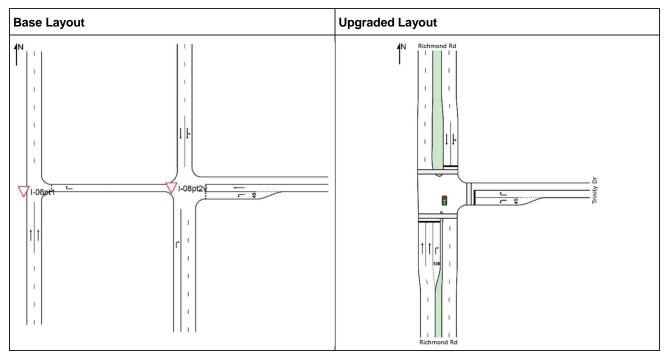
2021 without Links Road extension - Richmond Road/Trinity Drive
